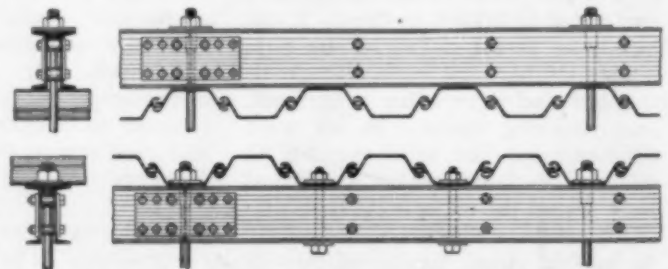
TWO METHODS OF ATTACHING WALES TO BULKHEADS
